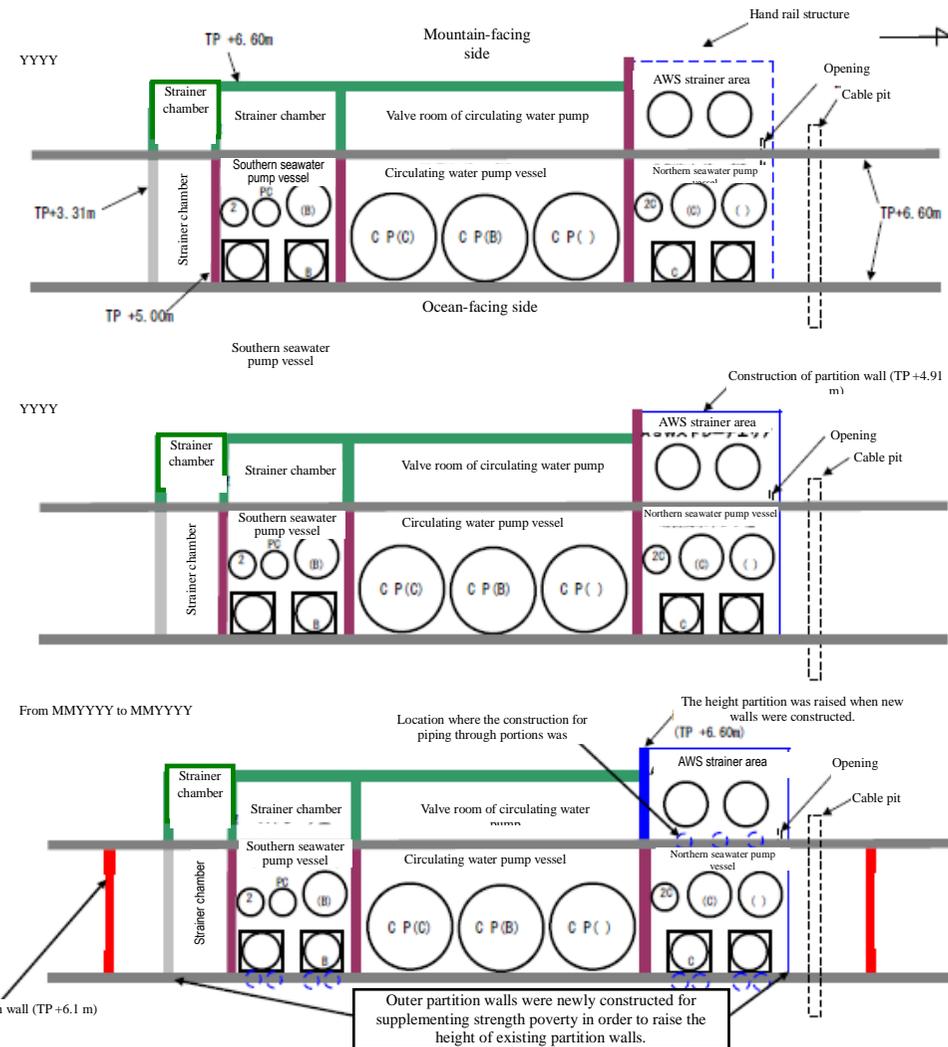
Details of Construction at Water Intakes for Anti-tsunami Measures (Construction of Partition Walls)
